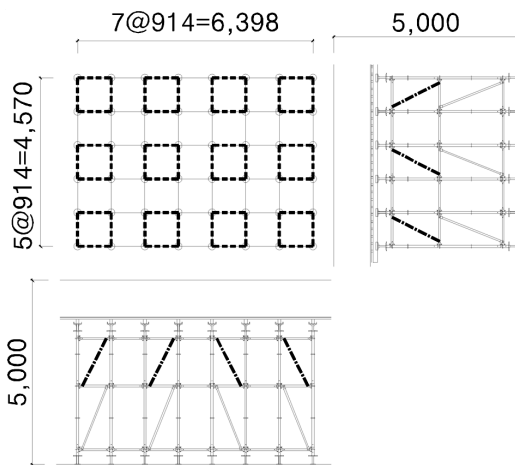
Standard drawing for concrete slab ($600 < t \leq 1,000$ mm).
